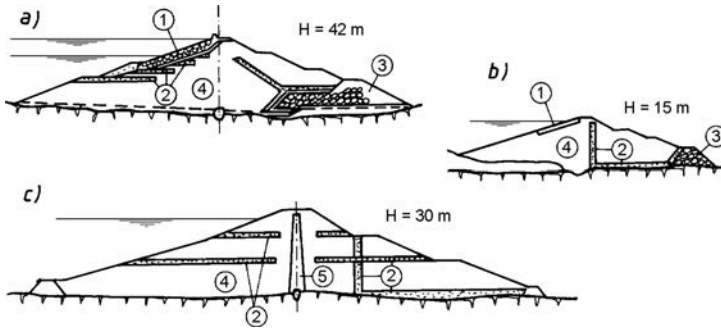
Drainage strips in the body of earthfill dams. (1) Slope protection; (2) drainage strips; (3) drainage prism; (4) the dam's body, made of low-permeable material; (5) clay core.
